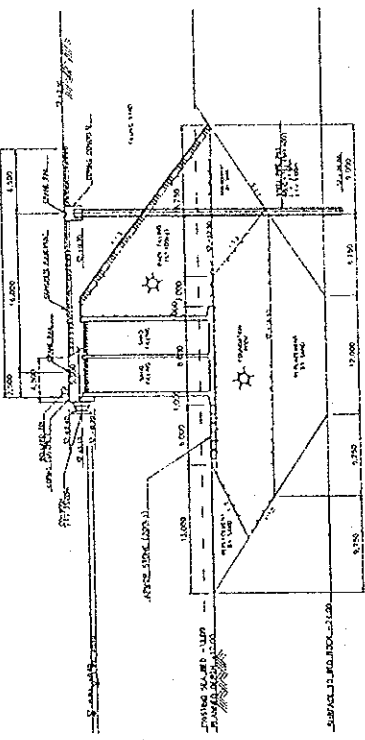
Typical Cross Section of Outer Breakwater
